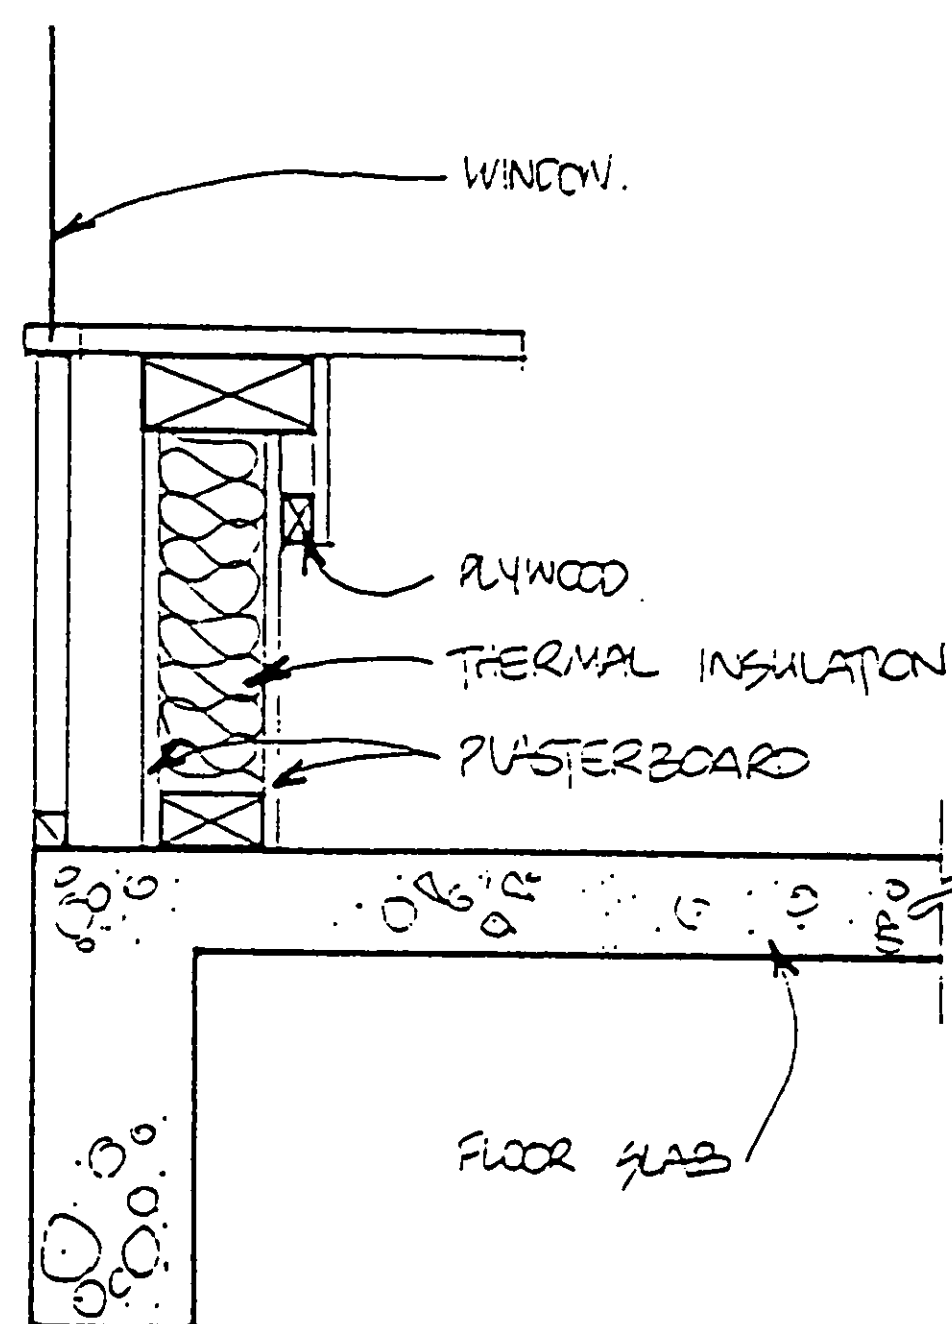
SECTION THROUGH CONCRETE FRAME, CONCRETE AND GLASS EXTERNAL WALL BUILDING.
